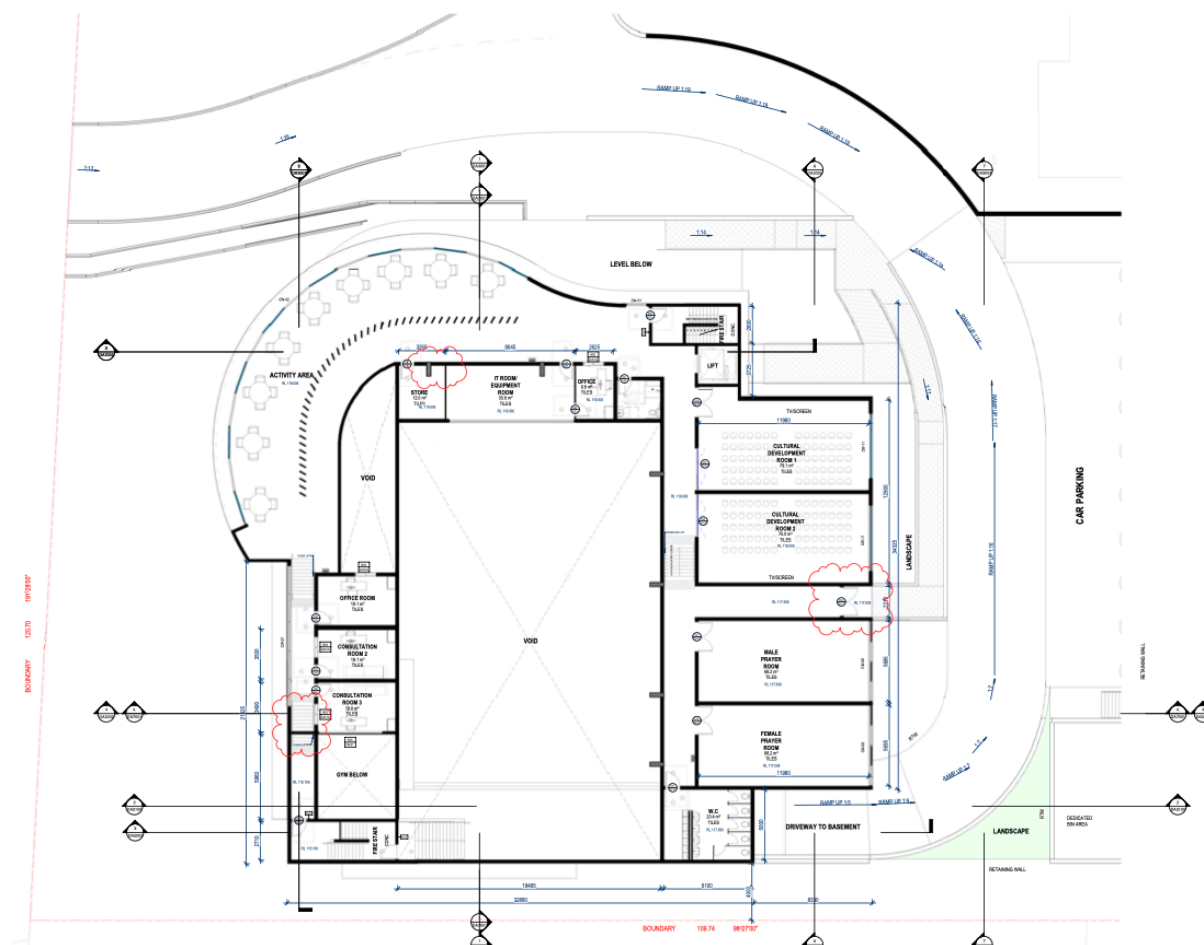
Ground Floor Plan, DA1002, Rev 10, dated 07/05/2024
